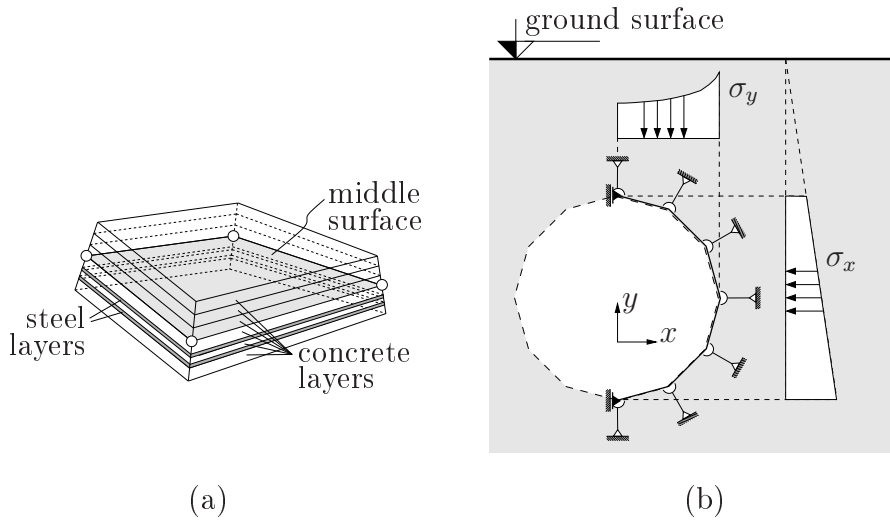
Illustration of (a) layered finite beam element (containing concrete and steel layers) and (b) beam-spring model [101]
